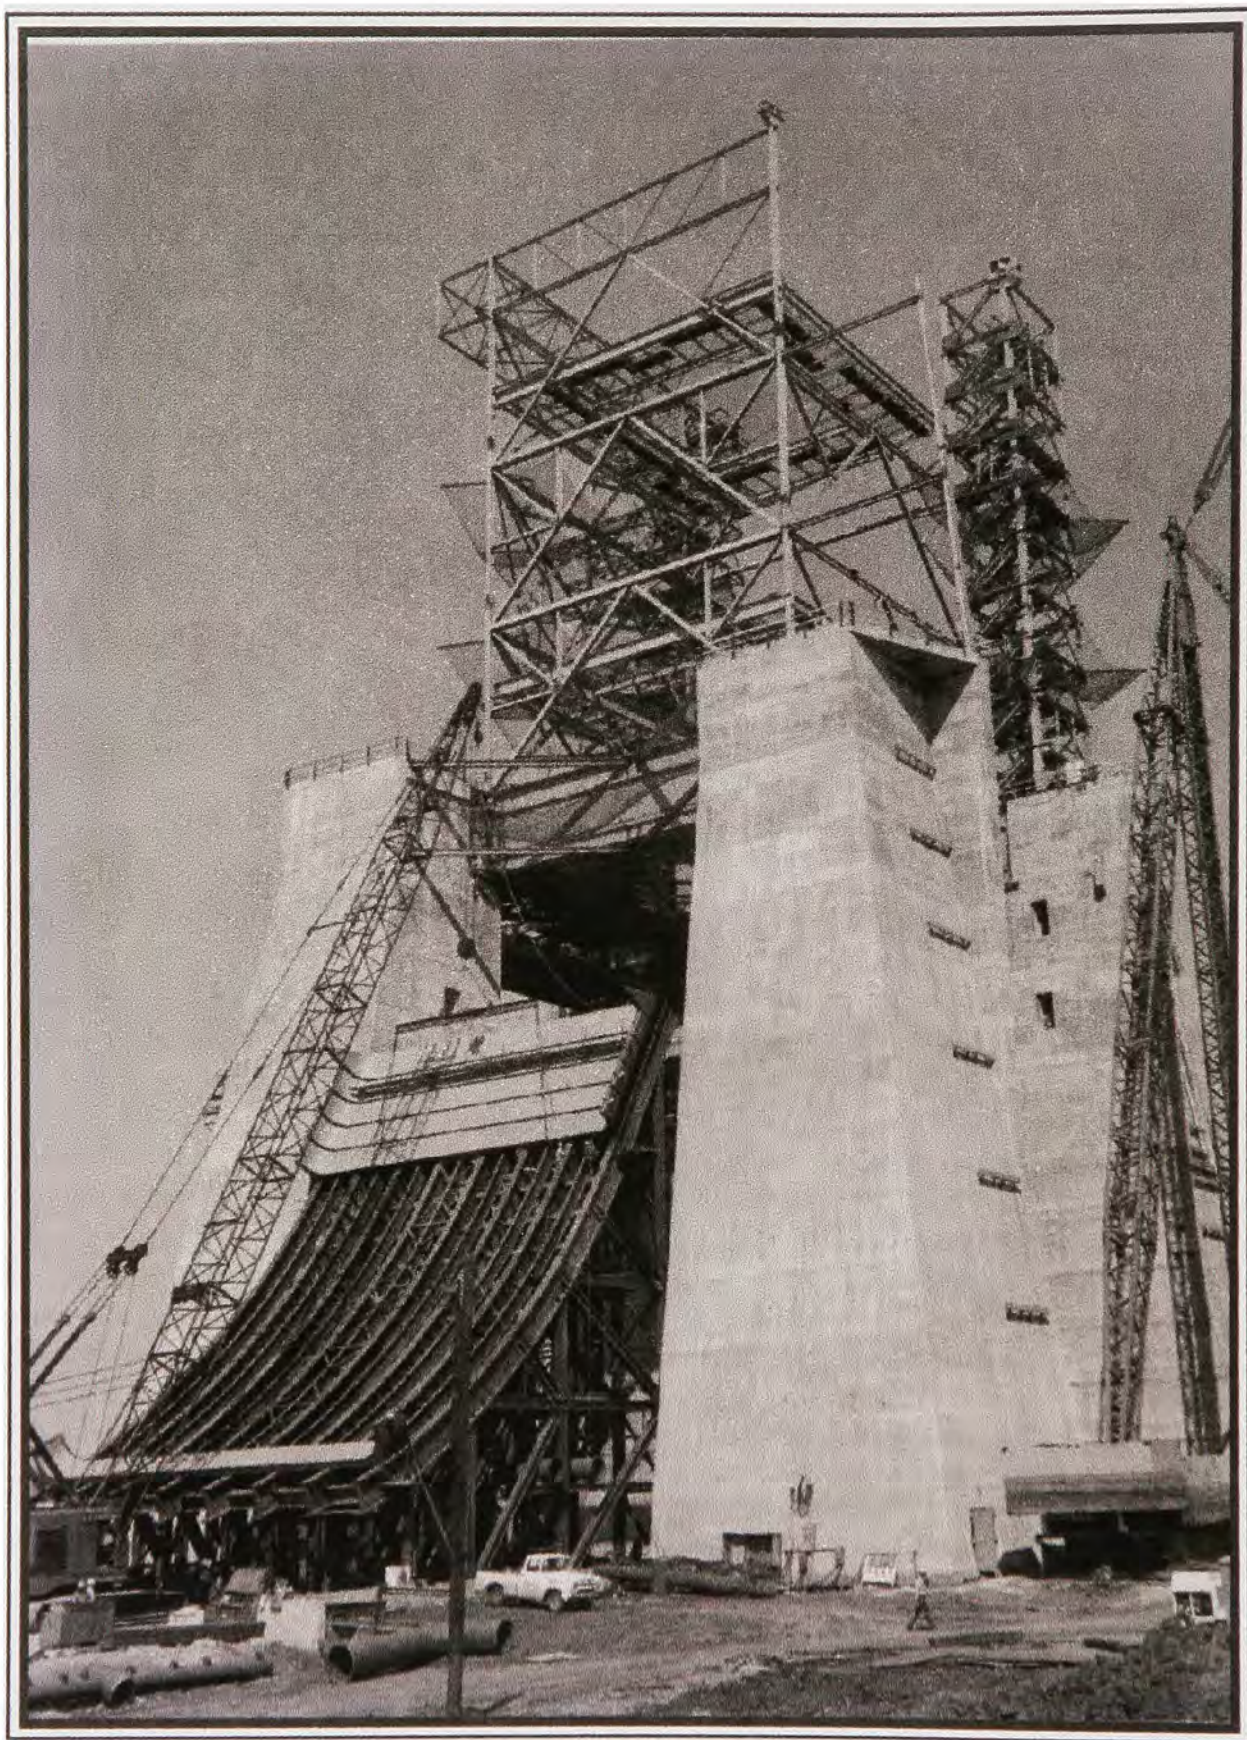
The Saturn V test tower, Marshall Space Flight Center, Huntsville, Alabama (Public Affairs, MDO).
